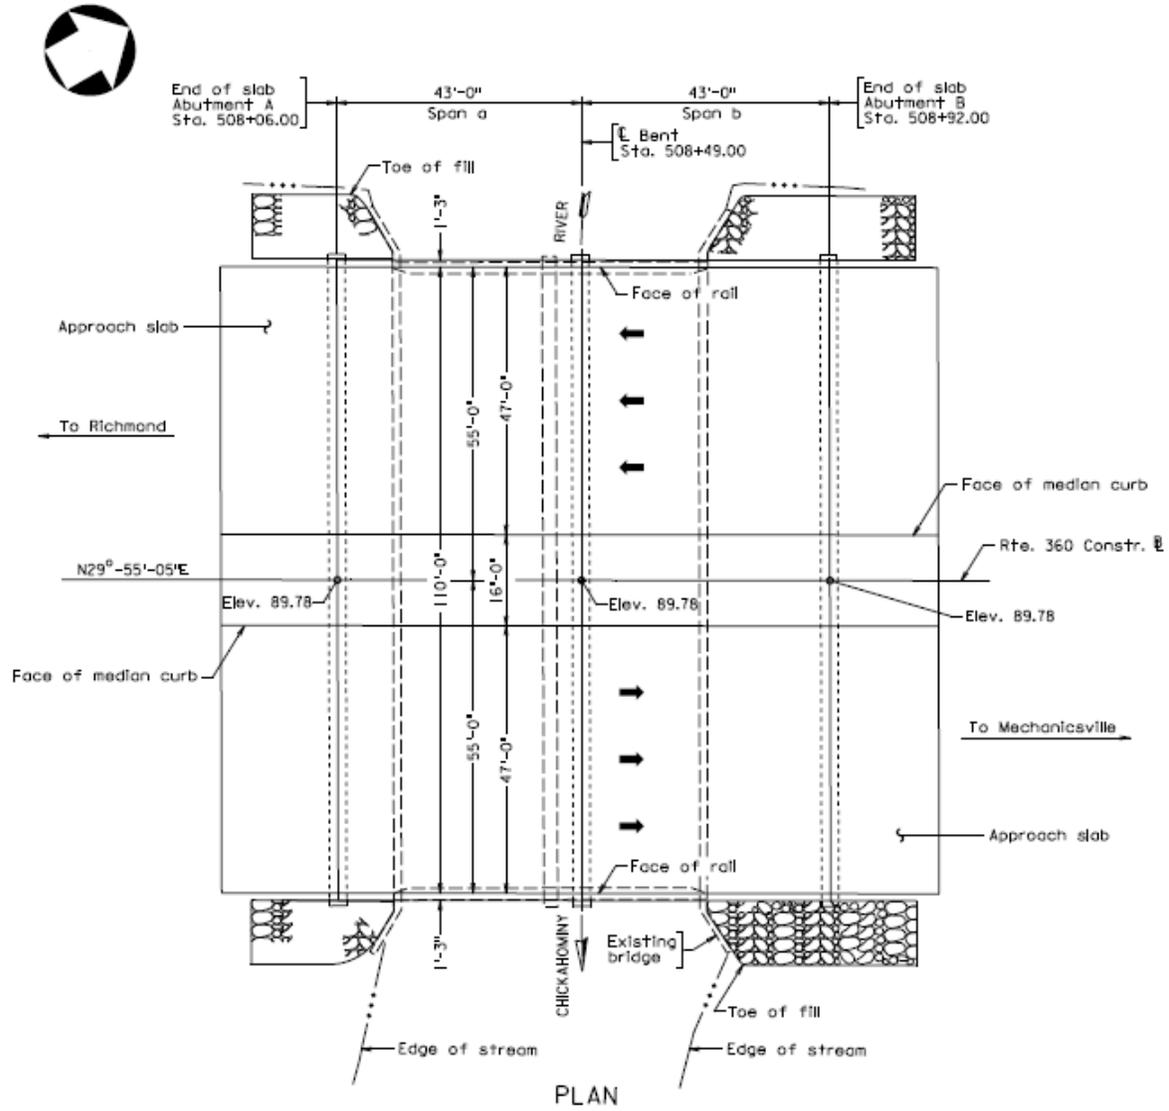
Preliminary plan view of the soon to be replaced two-span continuous bridge on Route 360 over Chickahominy River (Courtesy of Virginia Department of Transportation⁶)
